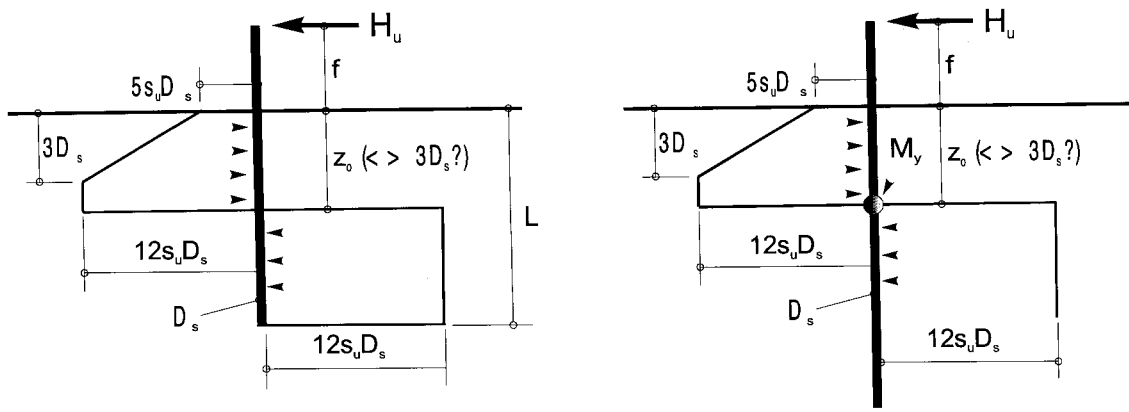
Alternative idealised pressure distribution for a pile embedded in clay. Left - short pile, right – long pile.
